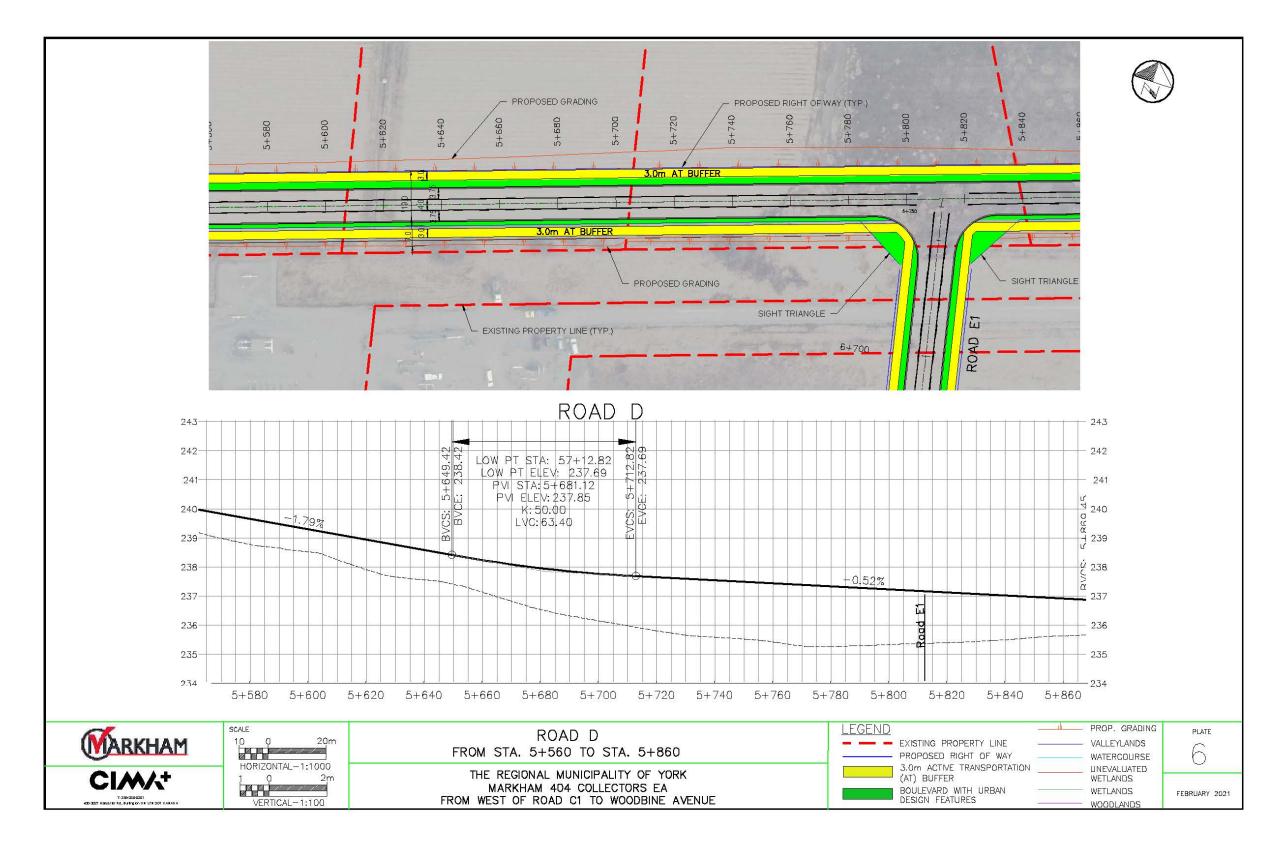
Preliminary Design Plate Road D Station 5+560 to Station 5+860
